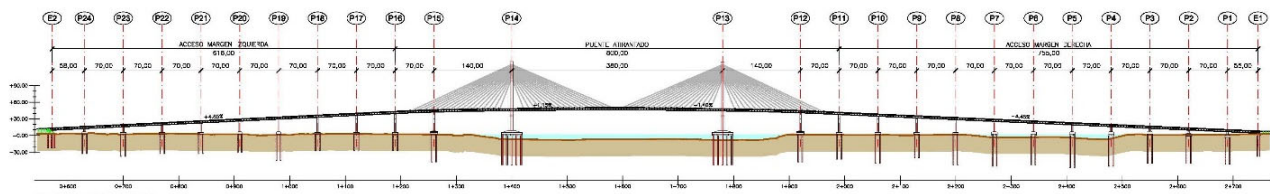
Elevation view of the New Pumarejo Bridge over the Magdalena River
